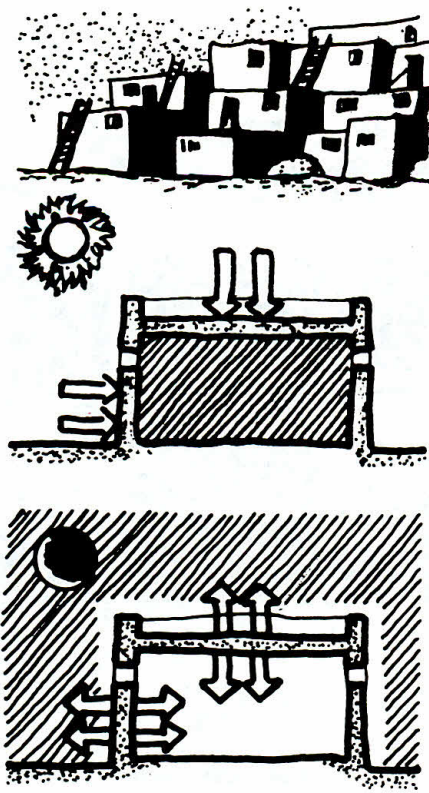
Buildings in hot-dry zones are traditionally constructed with thick walls and roofs and with very small opening [6, p.42].
